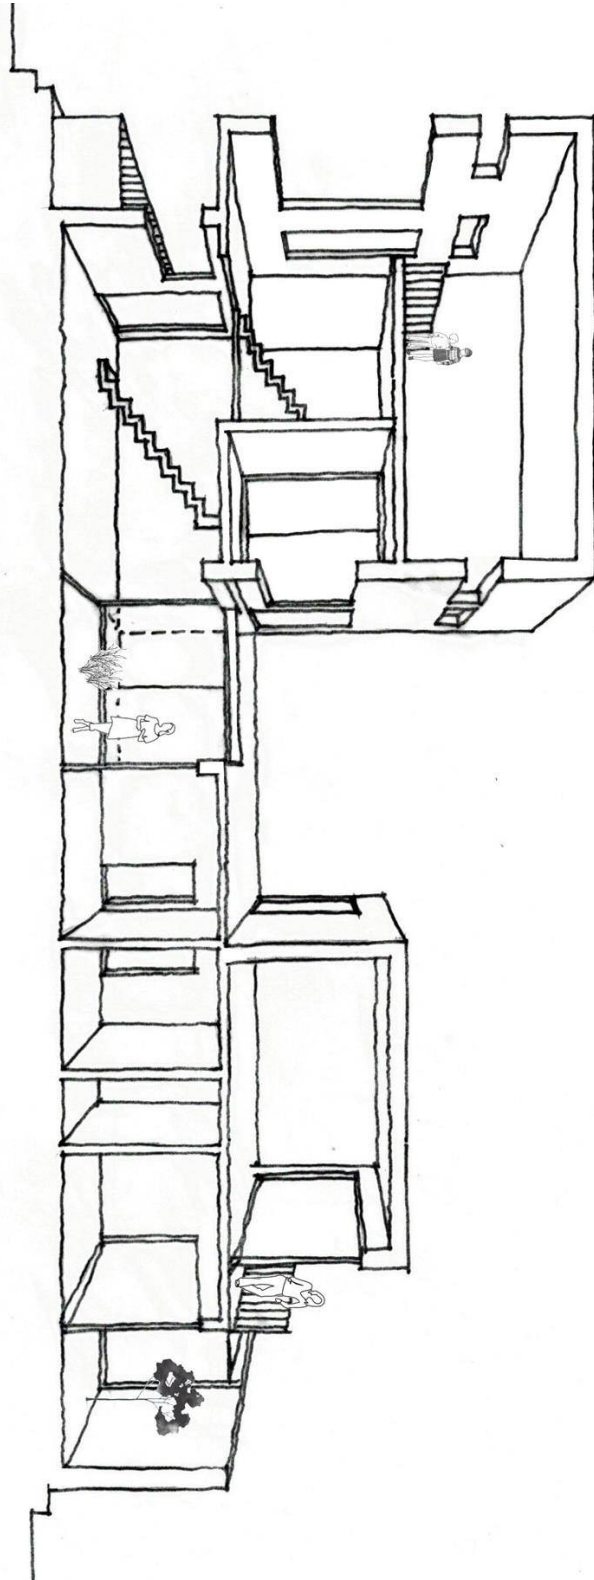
This perspective shows the interior space of the house (type 2) and the roof terrace.
